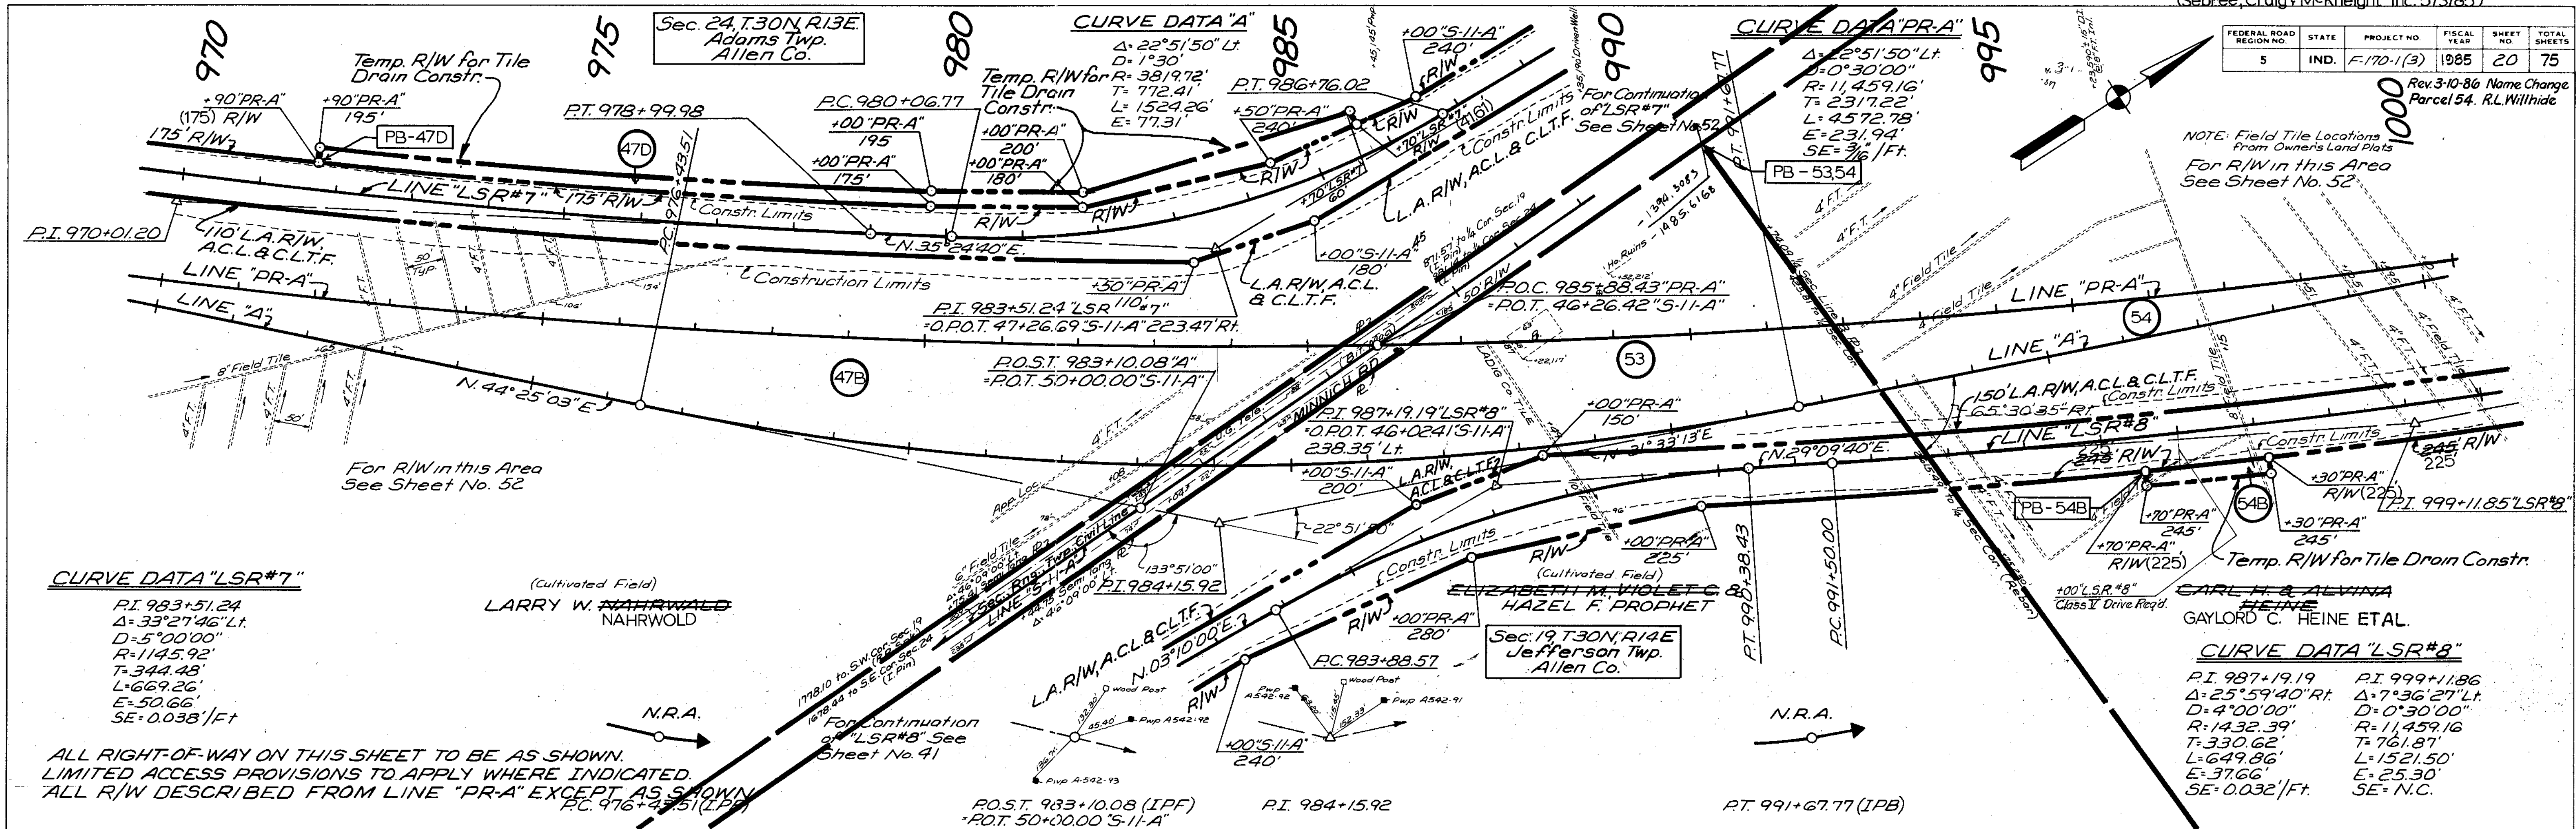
PLATE I - PLAN - PROFILE S. R. R. STANDARD
